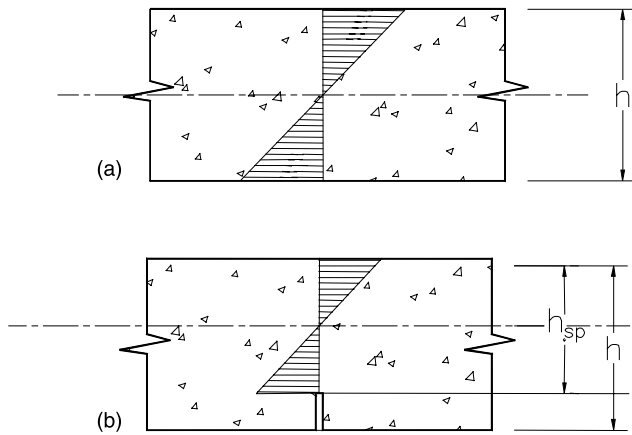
Assumed stress distribution at cracking. (a) Un-notched beam specimen and (b) notched beam specimen.
